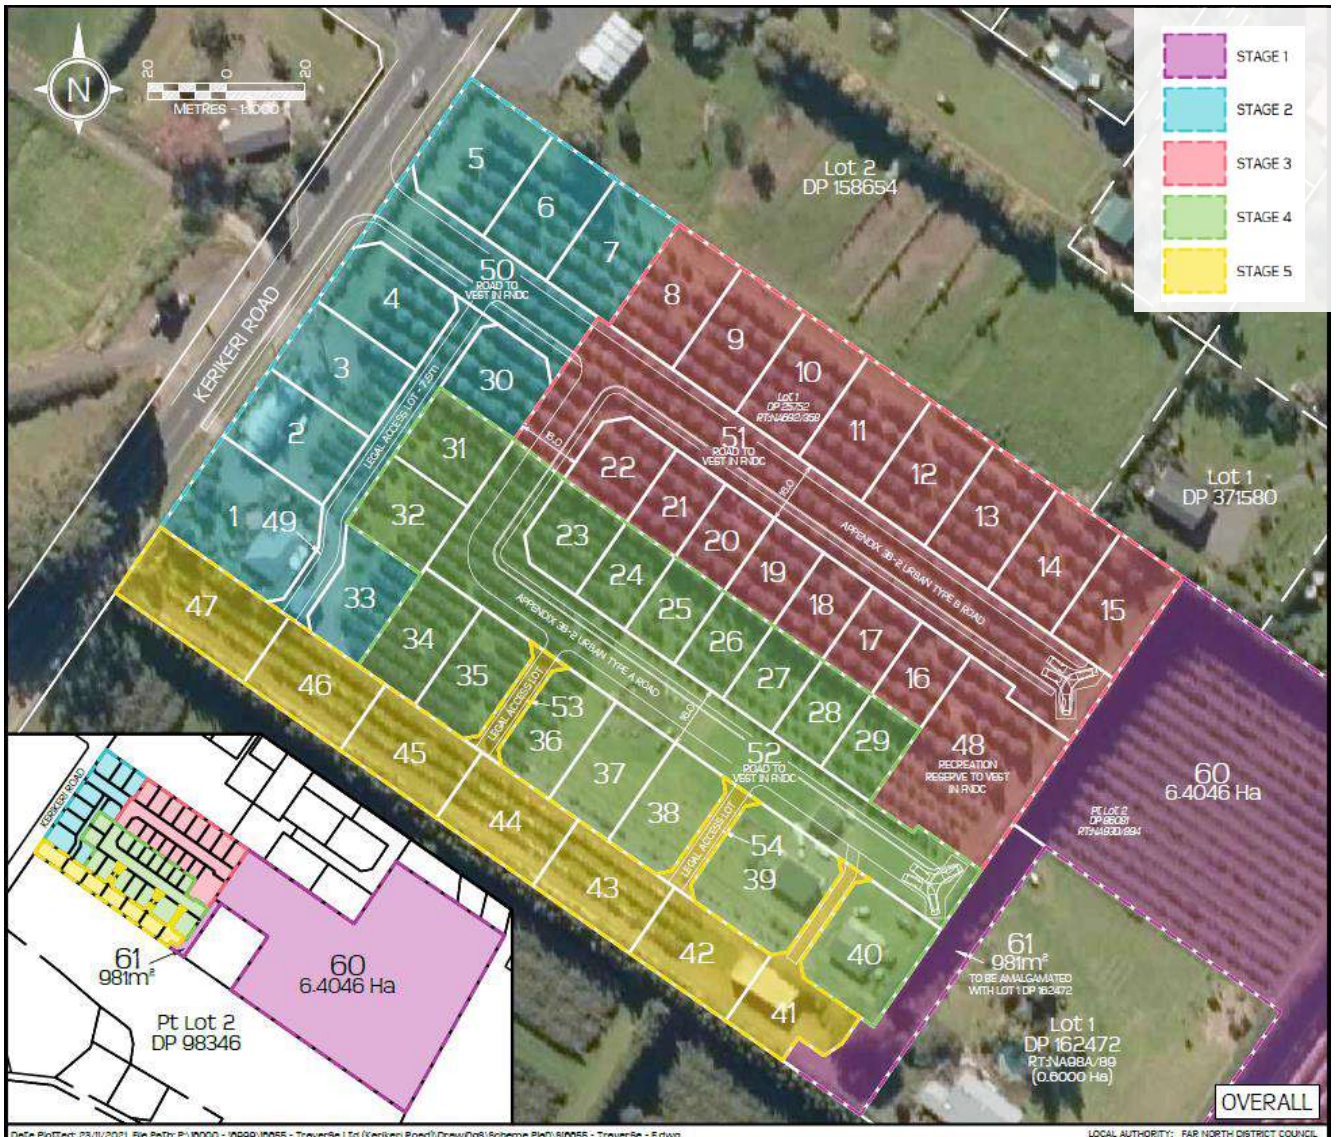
Subdivision scheme plan Rev. E (source: Reyburn & Bryant)
